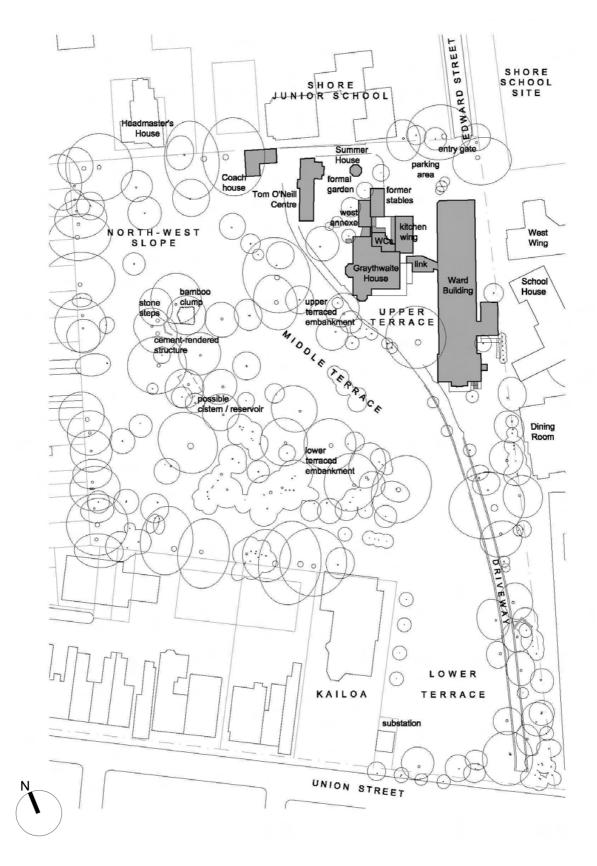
Graythwaite site plan, existing conditions. The footprint of the adjacent buildings of the Shore School and residential properties are also shown, not to scale.
